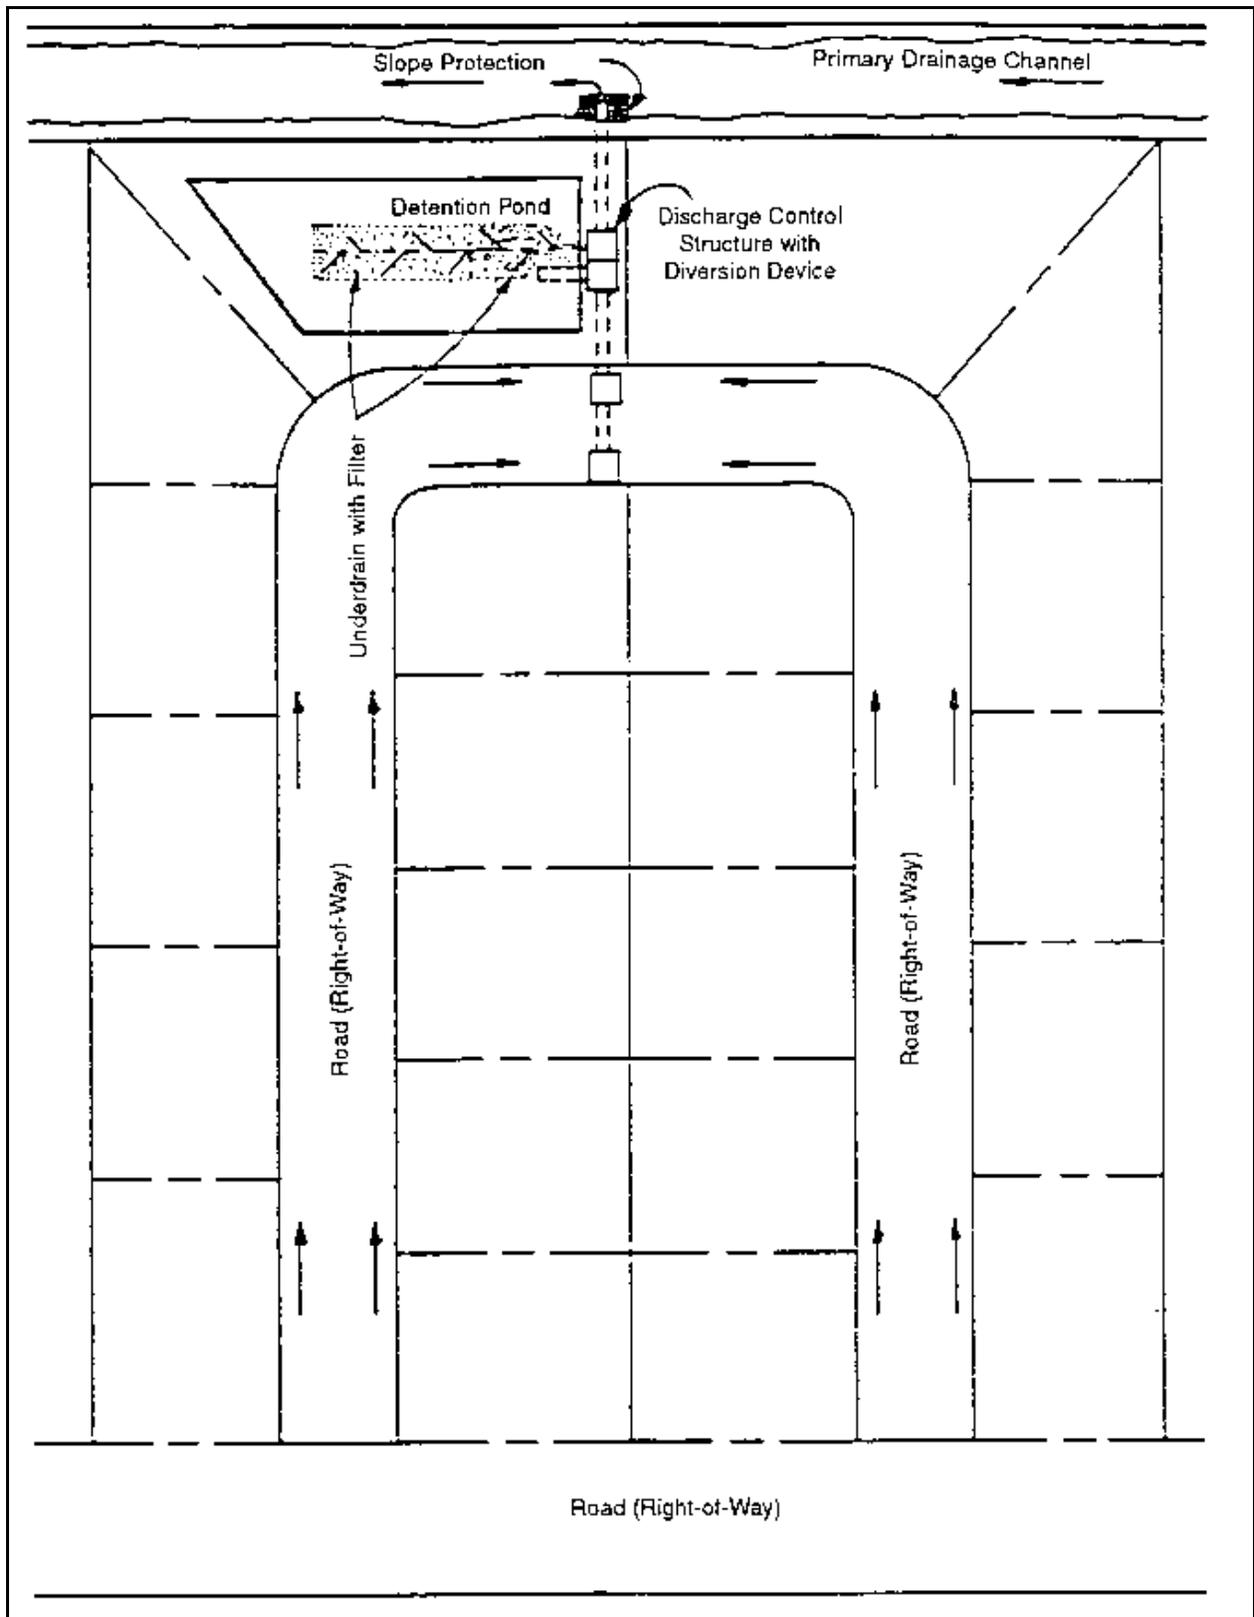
Typical Subdivision Layout Showing Off-Line Detention Pond and Outfall
